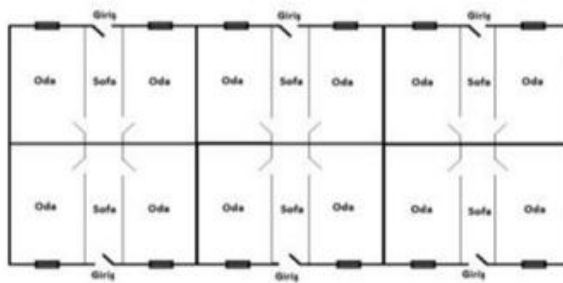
Kızılay Pavillion Houses (Orhan, 2019)
